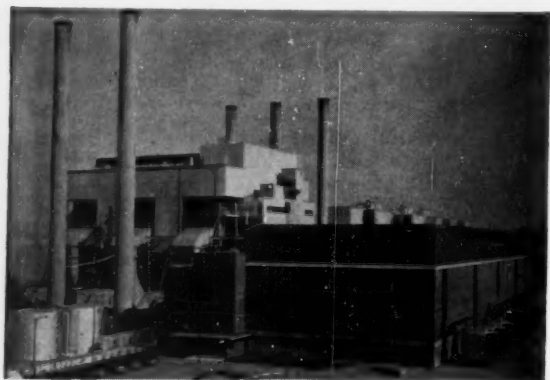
Steam-generating plant constructed of reinforced grouted brick masonry.
